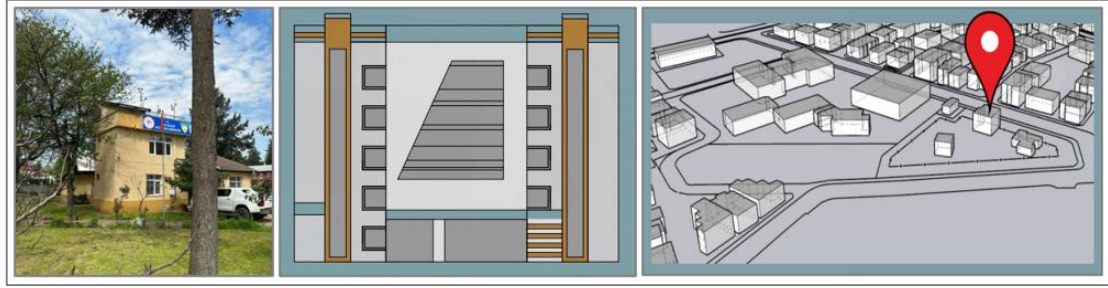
The building of Düzce Governorship Meteorology Directorate, located in the Uzun Mustafa neighborhood of the study area Düzce, the facade design proposal of the building and its location
